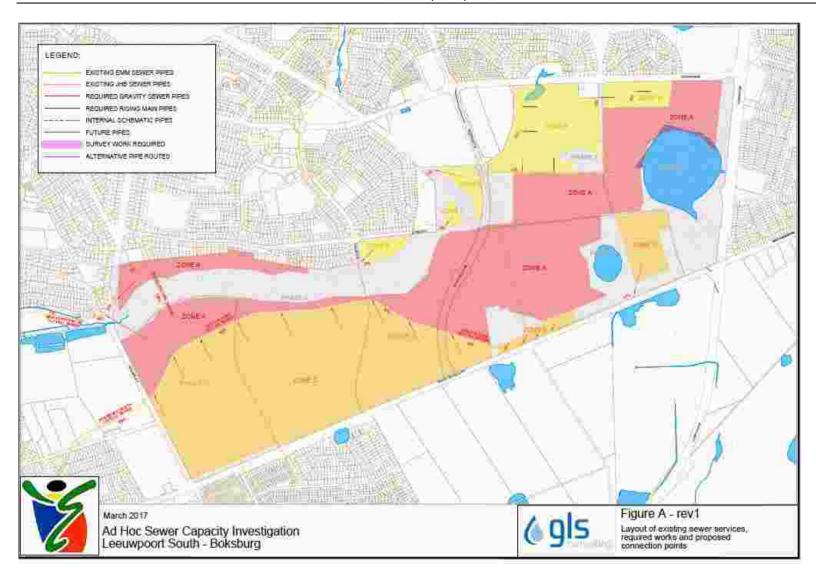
Sewer Layout (courtesy of GLS Consulting)
